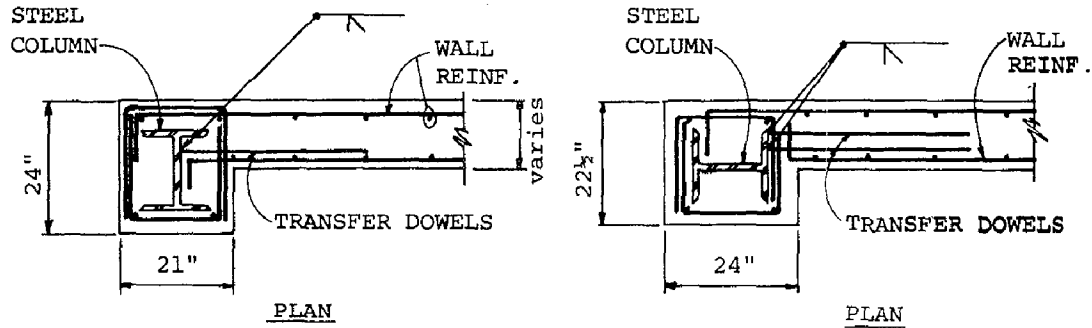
TYPICAL COLUMNS AT SHEAR WALL
